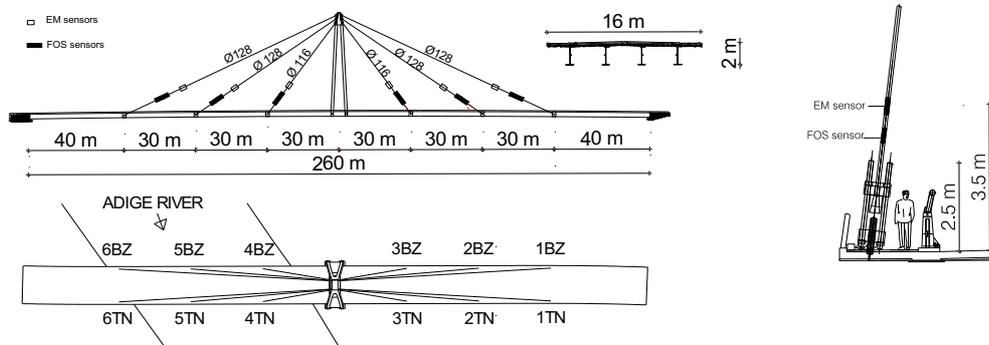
Longitudinal section of the bridge and sensor layout (upper left); plan view of the bridge (lower left); cross-section of the bridge (right).
